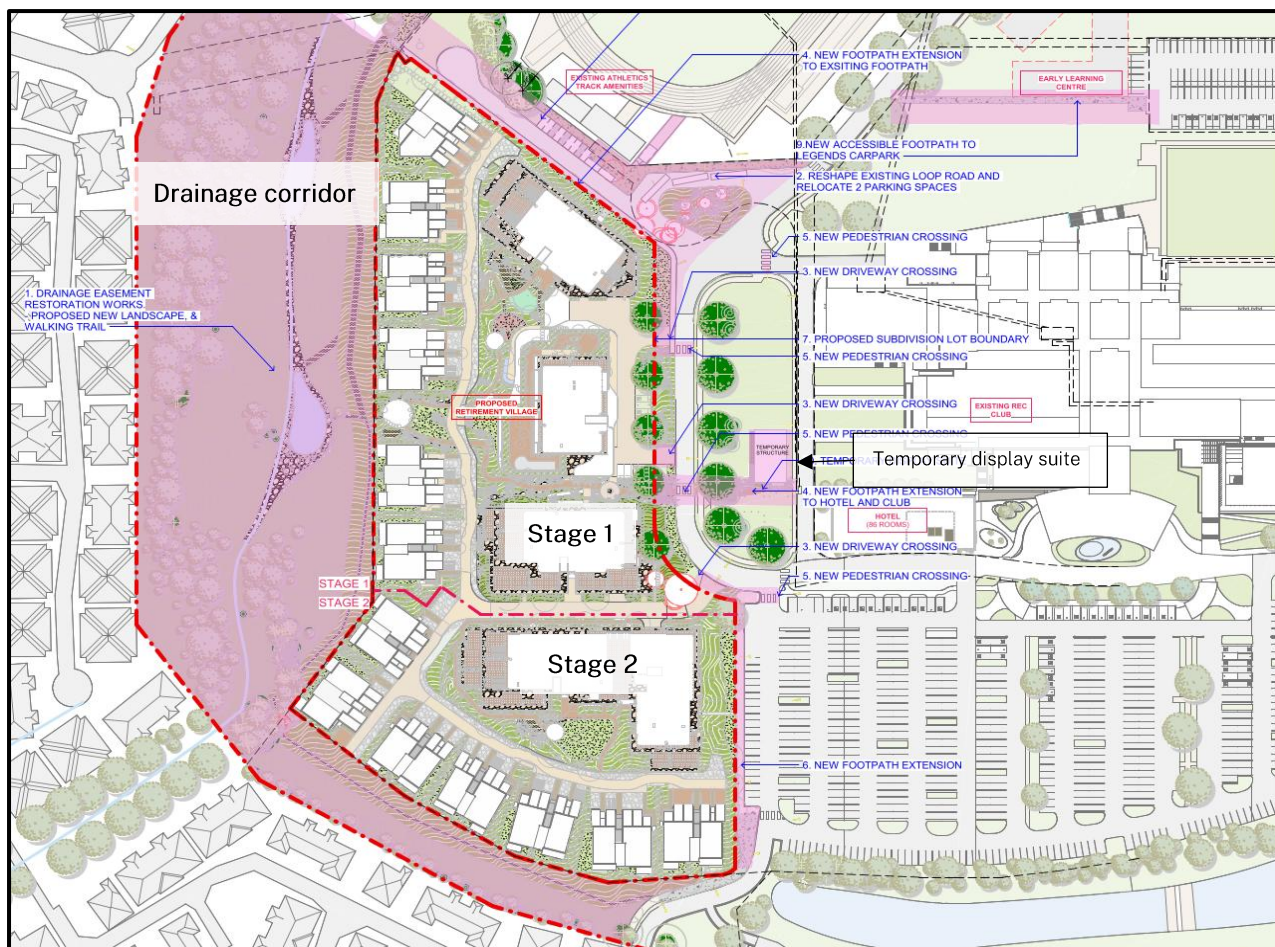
| Proposed scope of works plan (source: Applicant EIS)
